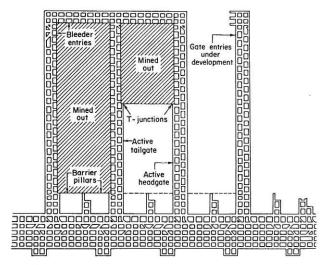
Typical longwall panel layout, showing chain pillars in development, headgate, tailgate, and bleeder entries.
